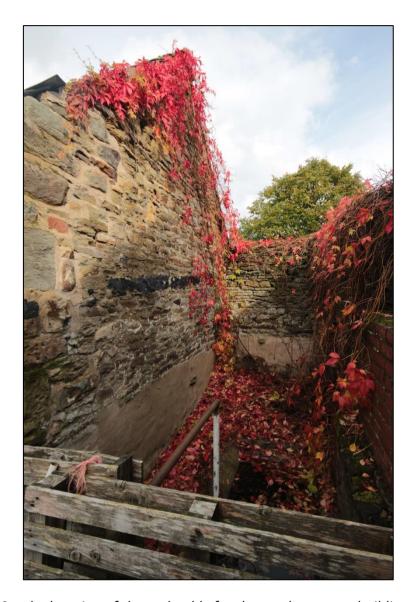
South elevation of the end gable for the north-western building within the farmyard complex.
